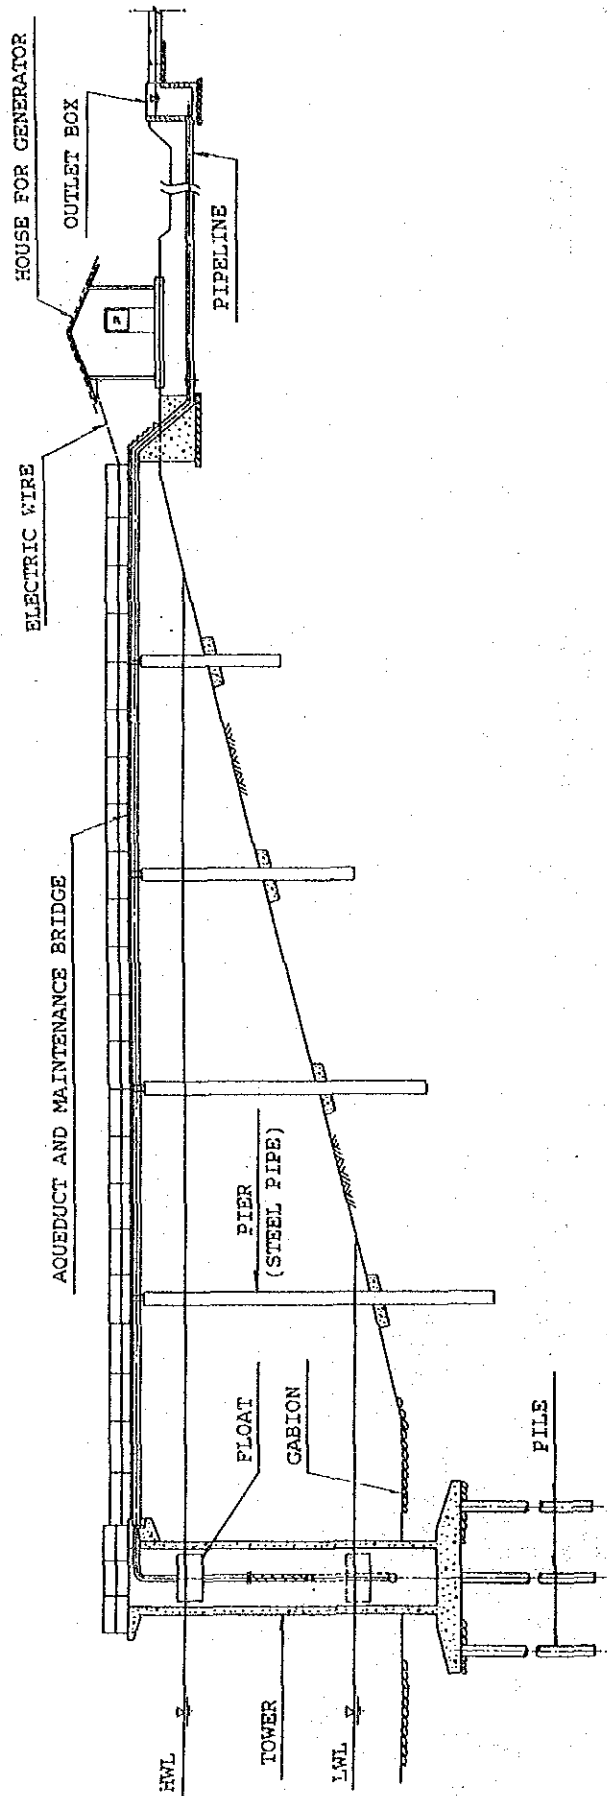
4 Floating Pump Type (Floating Tower System)
